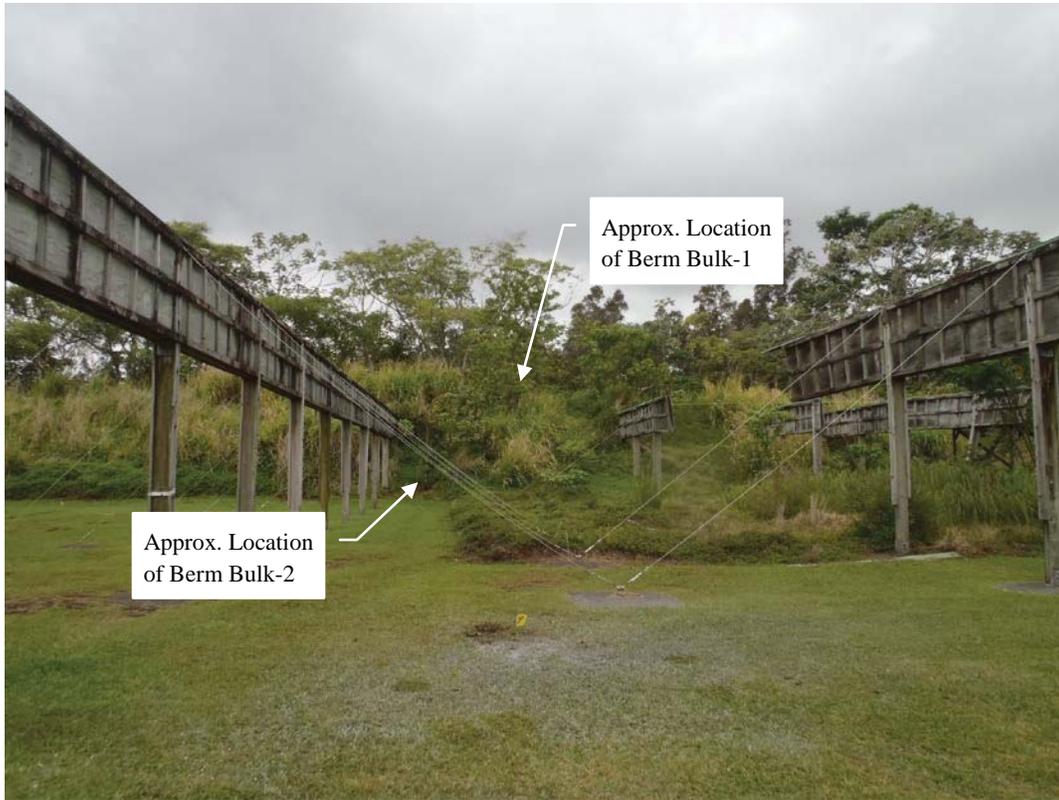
Berm in middle of proposed new baffle site. Yellow flag in foreground marks boring B-4.
